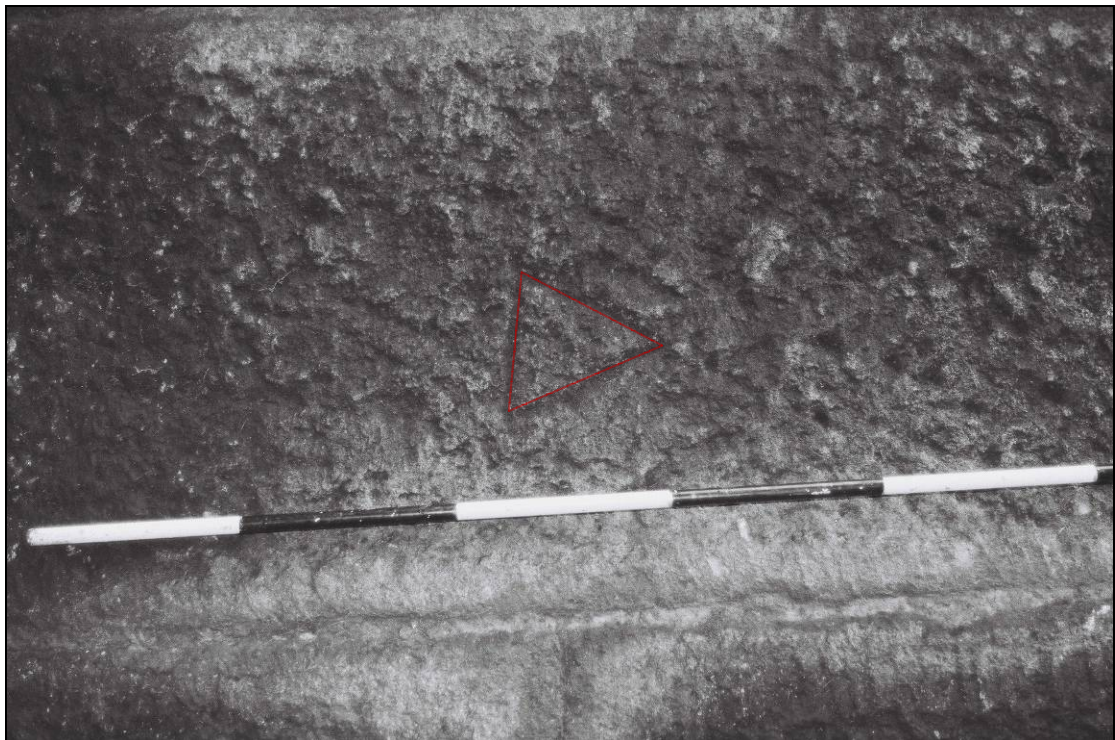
Detail of masons mark on masonry of wheel pit (film 12:17)
